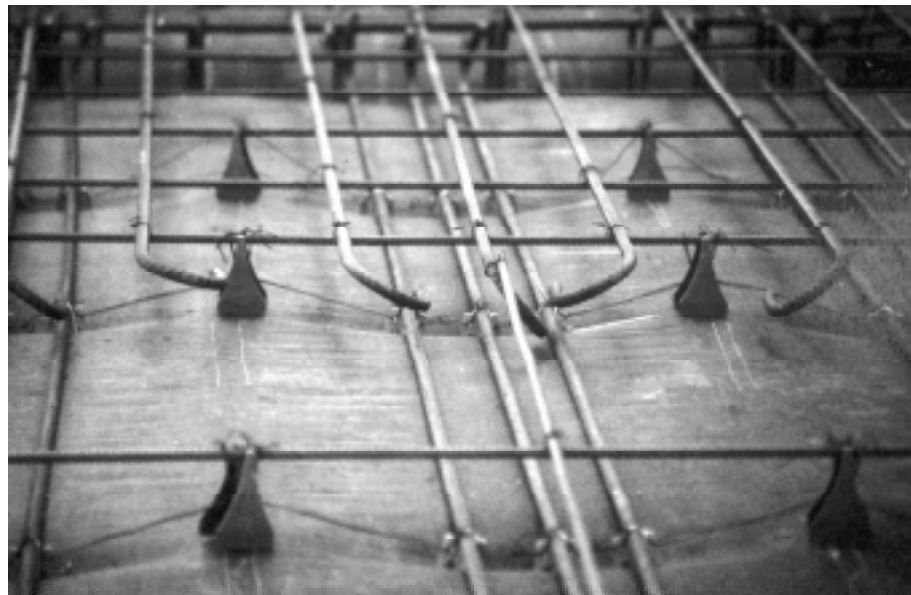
Photograph of top and bottom reinforcing steel placed on a ribbed one-way slab formwork: top steel supported on shoring beams, and bottom steel tied to fabric membrane.
